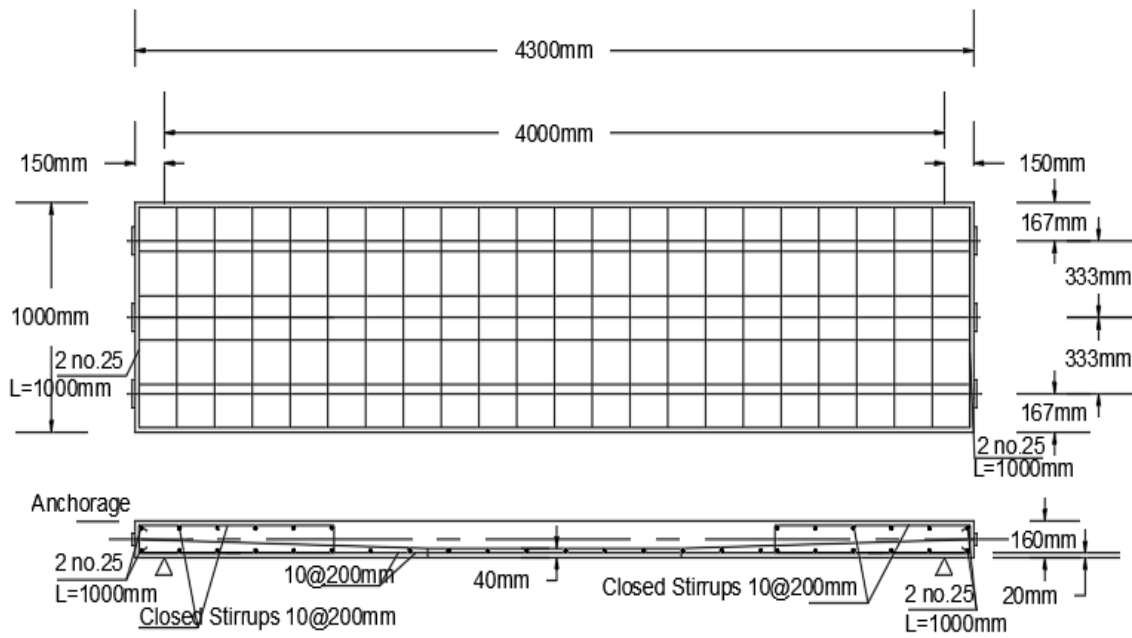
Post-tension unbonded slab cross-section and plan with non-prestressing steel reinforcement with all the reinforcement and tendons details.
